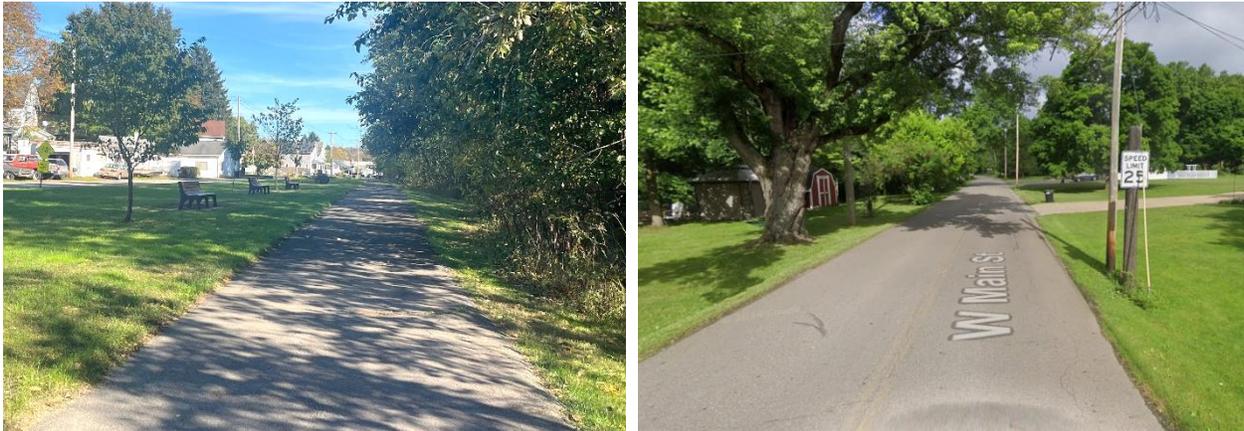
East Palestine Walking Trail on W Main Street, west of Brookdale Avenue (Left) and east of Brookdale Avenue (Right), where there are no existing facilities.
